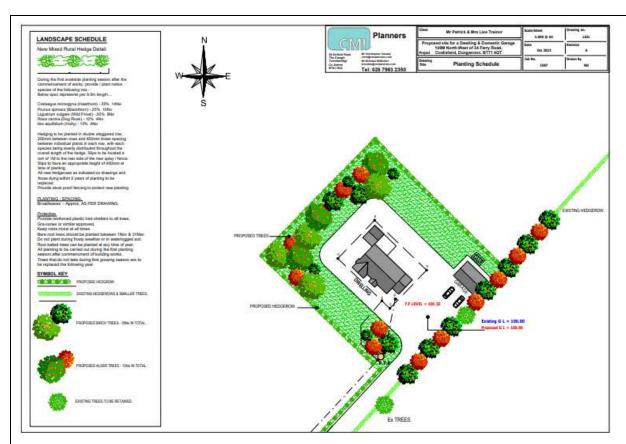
Block plan of dwelling and garage currently proposed, including revised landscaping plan
